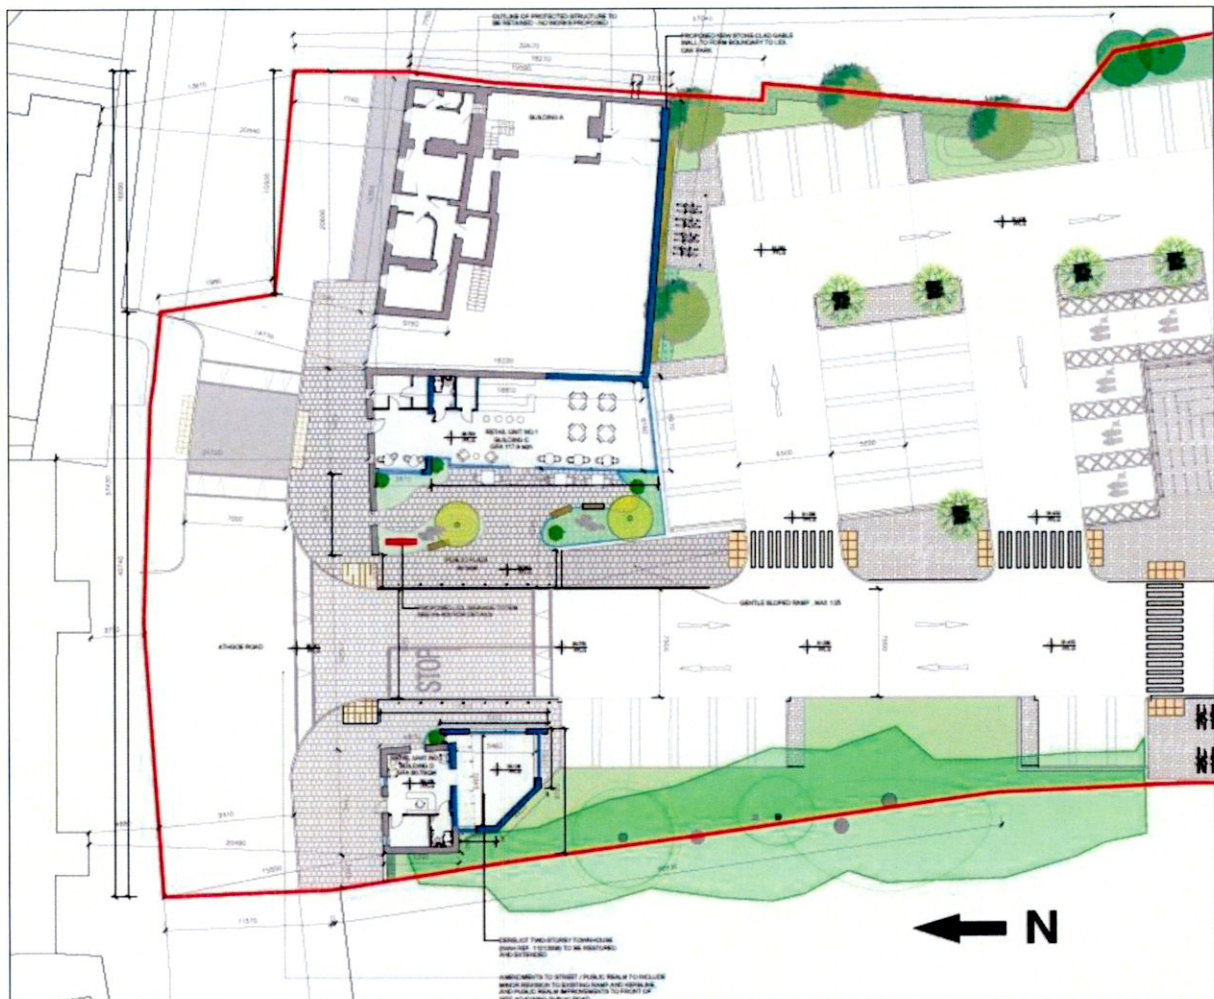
Proposed site layout at main street-fronting entrance to site after Darmody Architecture
